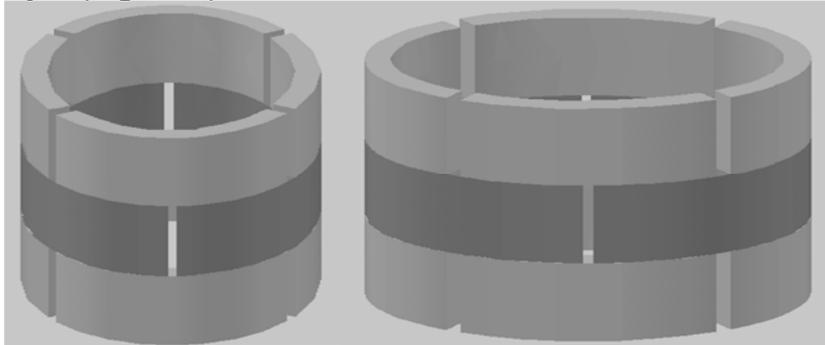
Schematic diagram of assembling staggered joints of reinforced concrete blocks
